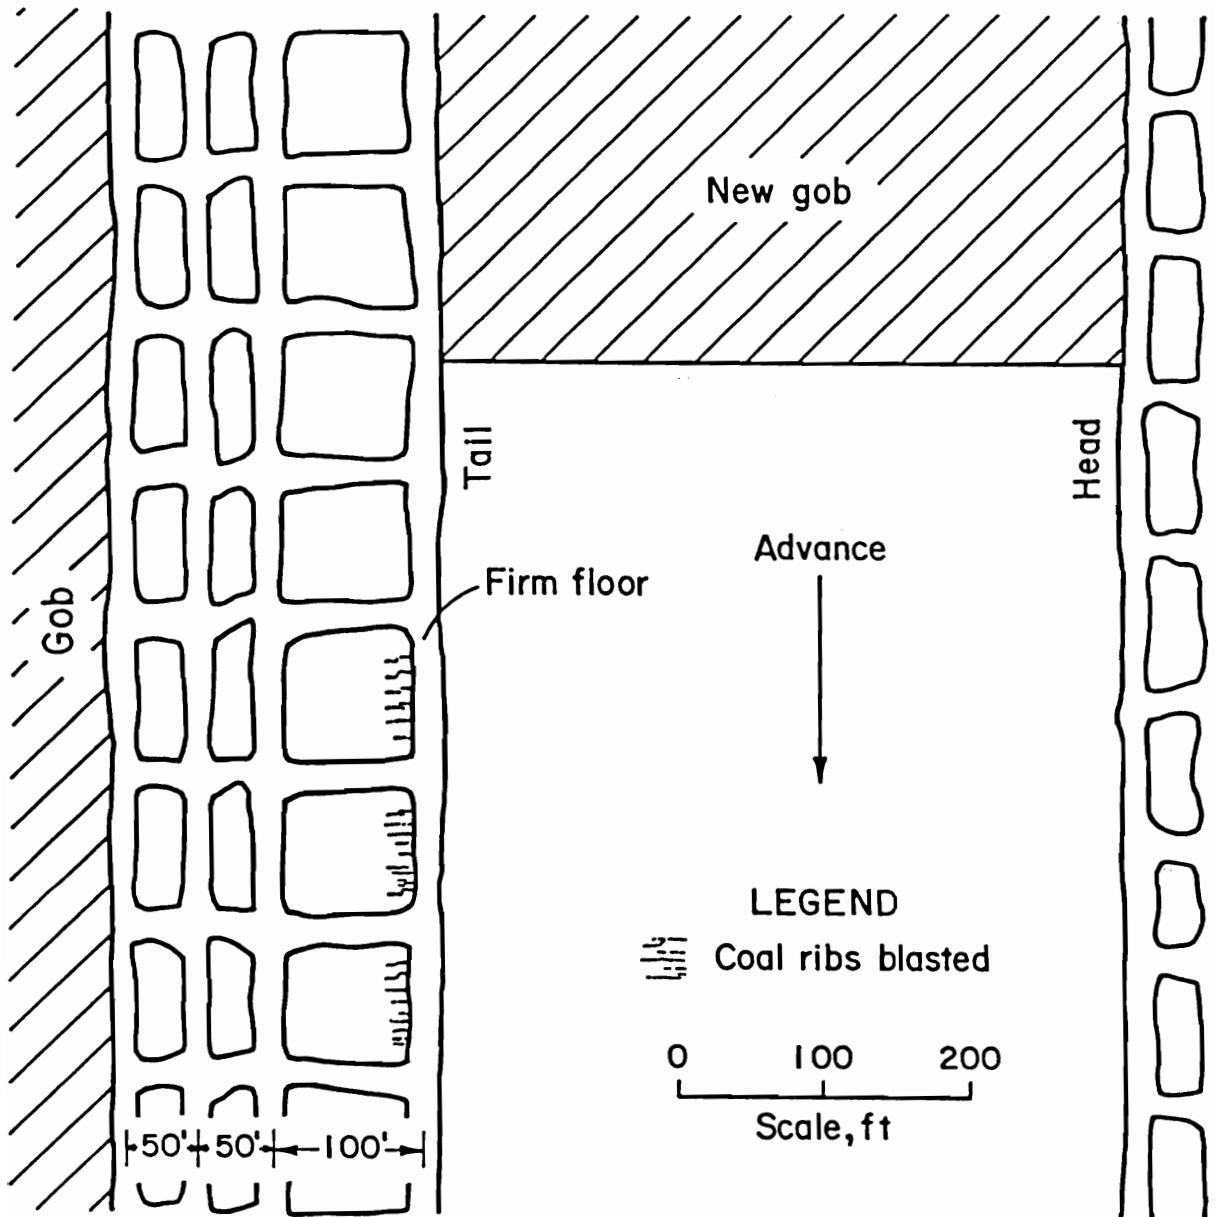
Plan view of volley fire softening technique, used on tail entry of longwall gate roads for bump control, Beatrice Mine (After Campoli, et al., 1987).
